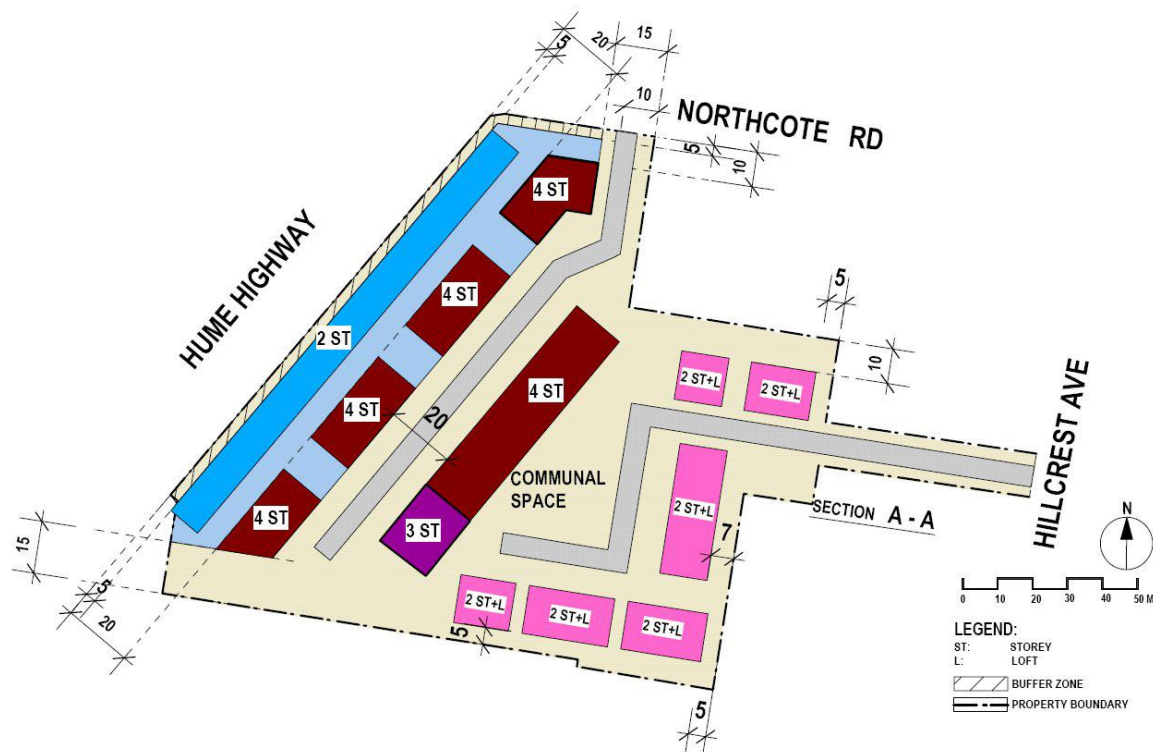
A: Proposed height and setback standards for a development that consolidates the allotments at 225–243A Hume Highway, 112 Northcote Road, and 24 Hillcrest Avenue, Greenacre into a single allotment
